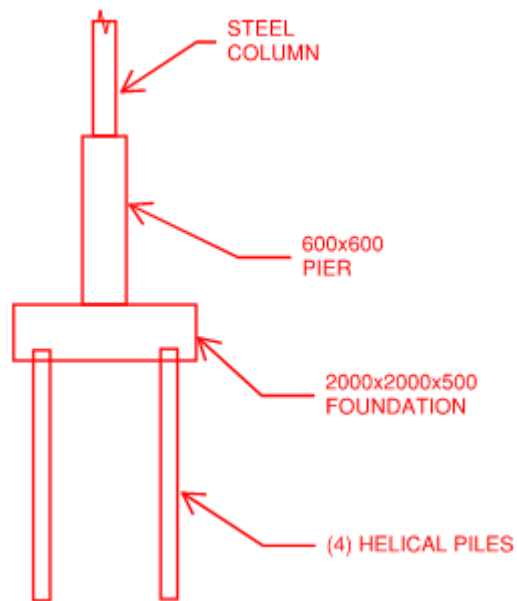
Typical Foundation Detail – Proposed Outdoor Gantry.
